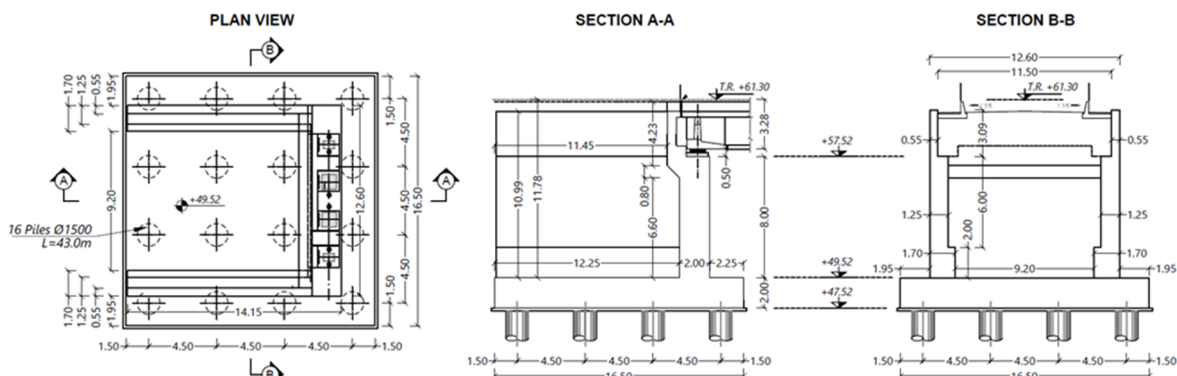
Case study – Abutment plan view, longitudinal and cross section.
